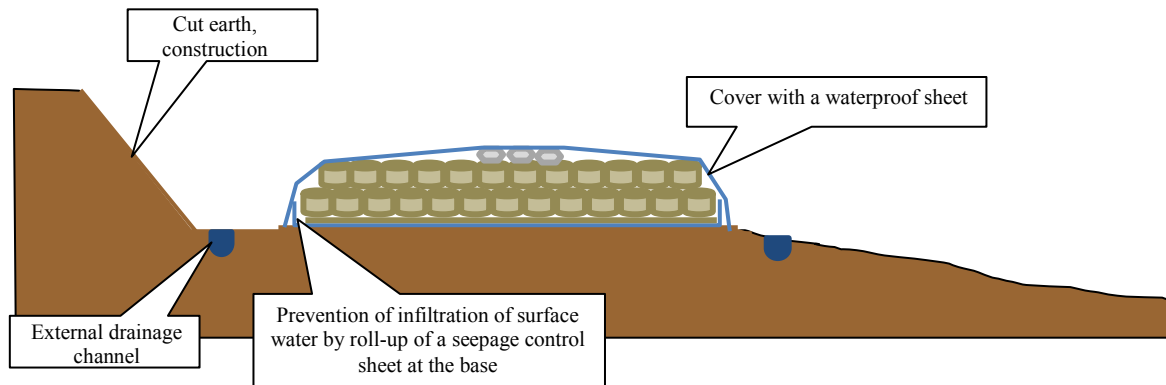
Installation of the storage site on the sloping ground (Example)
